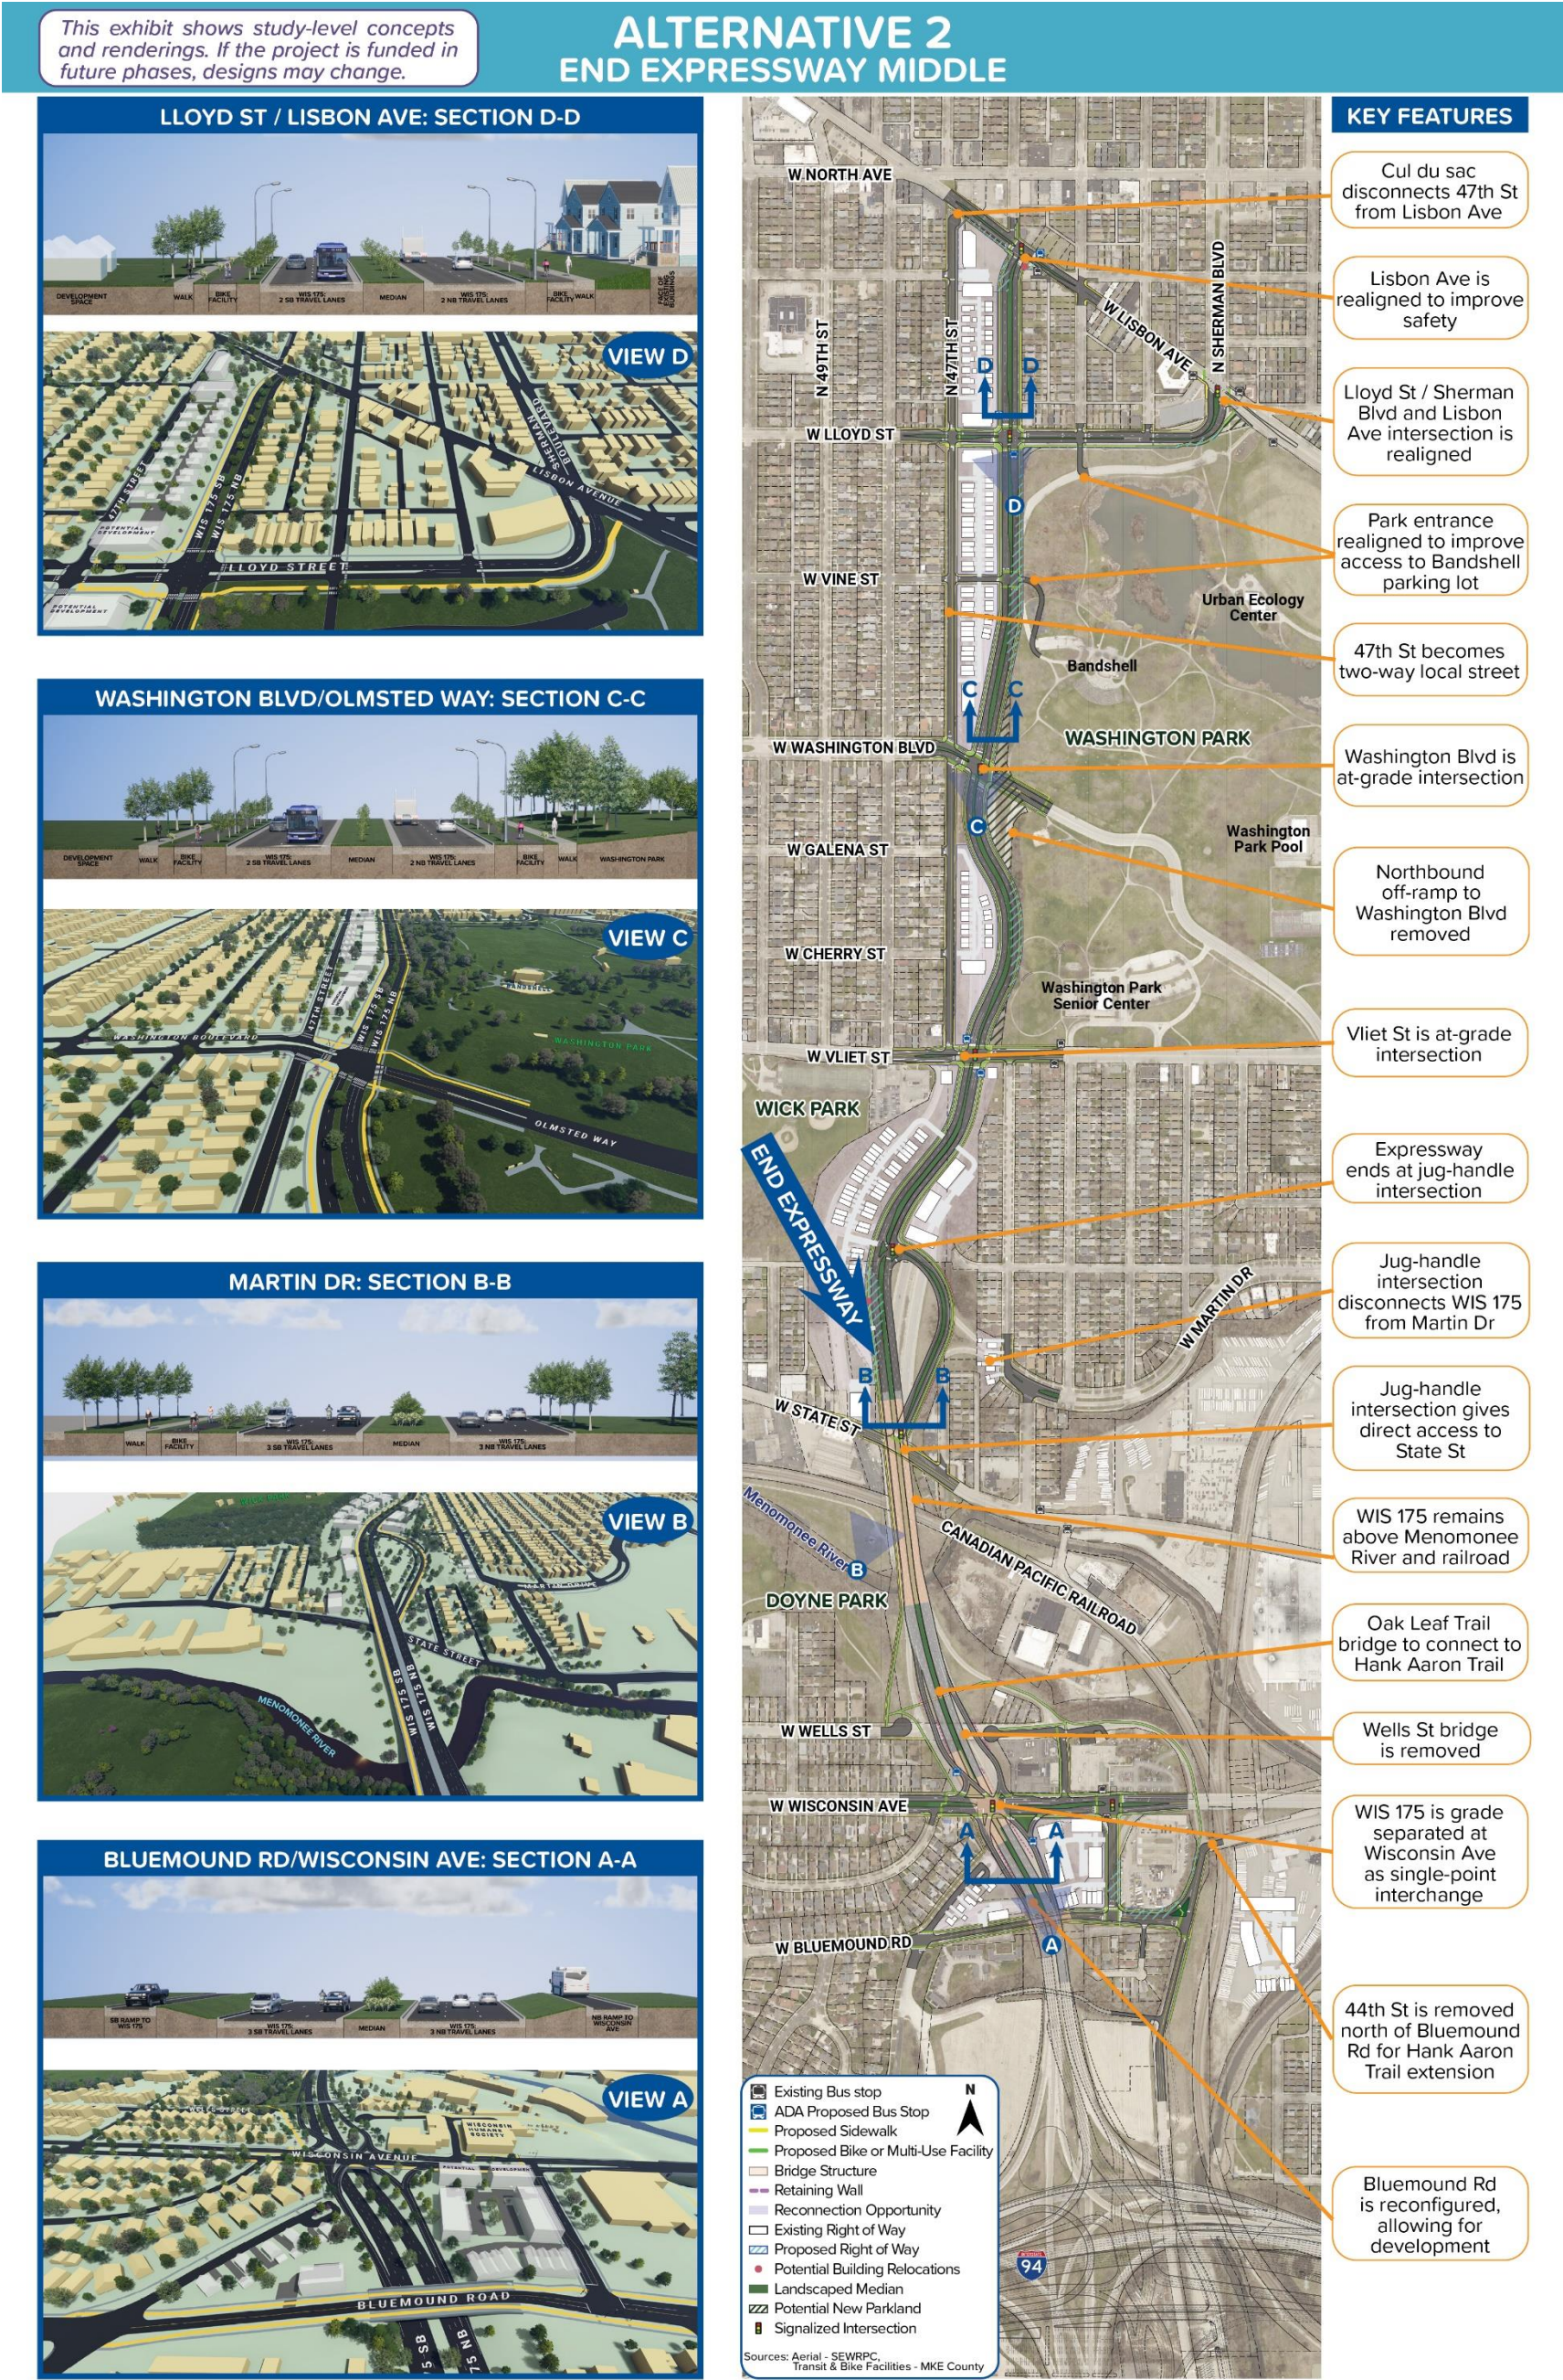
WIS 175 | Alternative 2 | Detailed plan view
